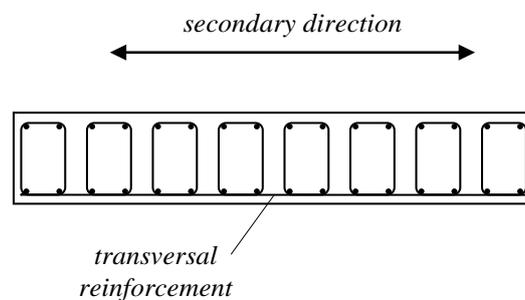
Common design of shear reinforcement in a concrete slab where the transversal reinforcement may resist the transverse tensile component created by the shear reinforcement arrangement.
